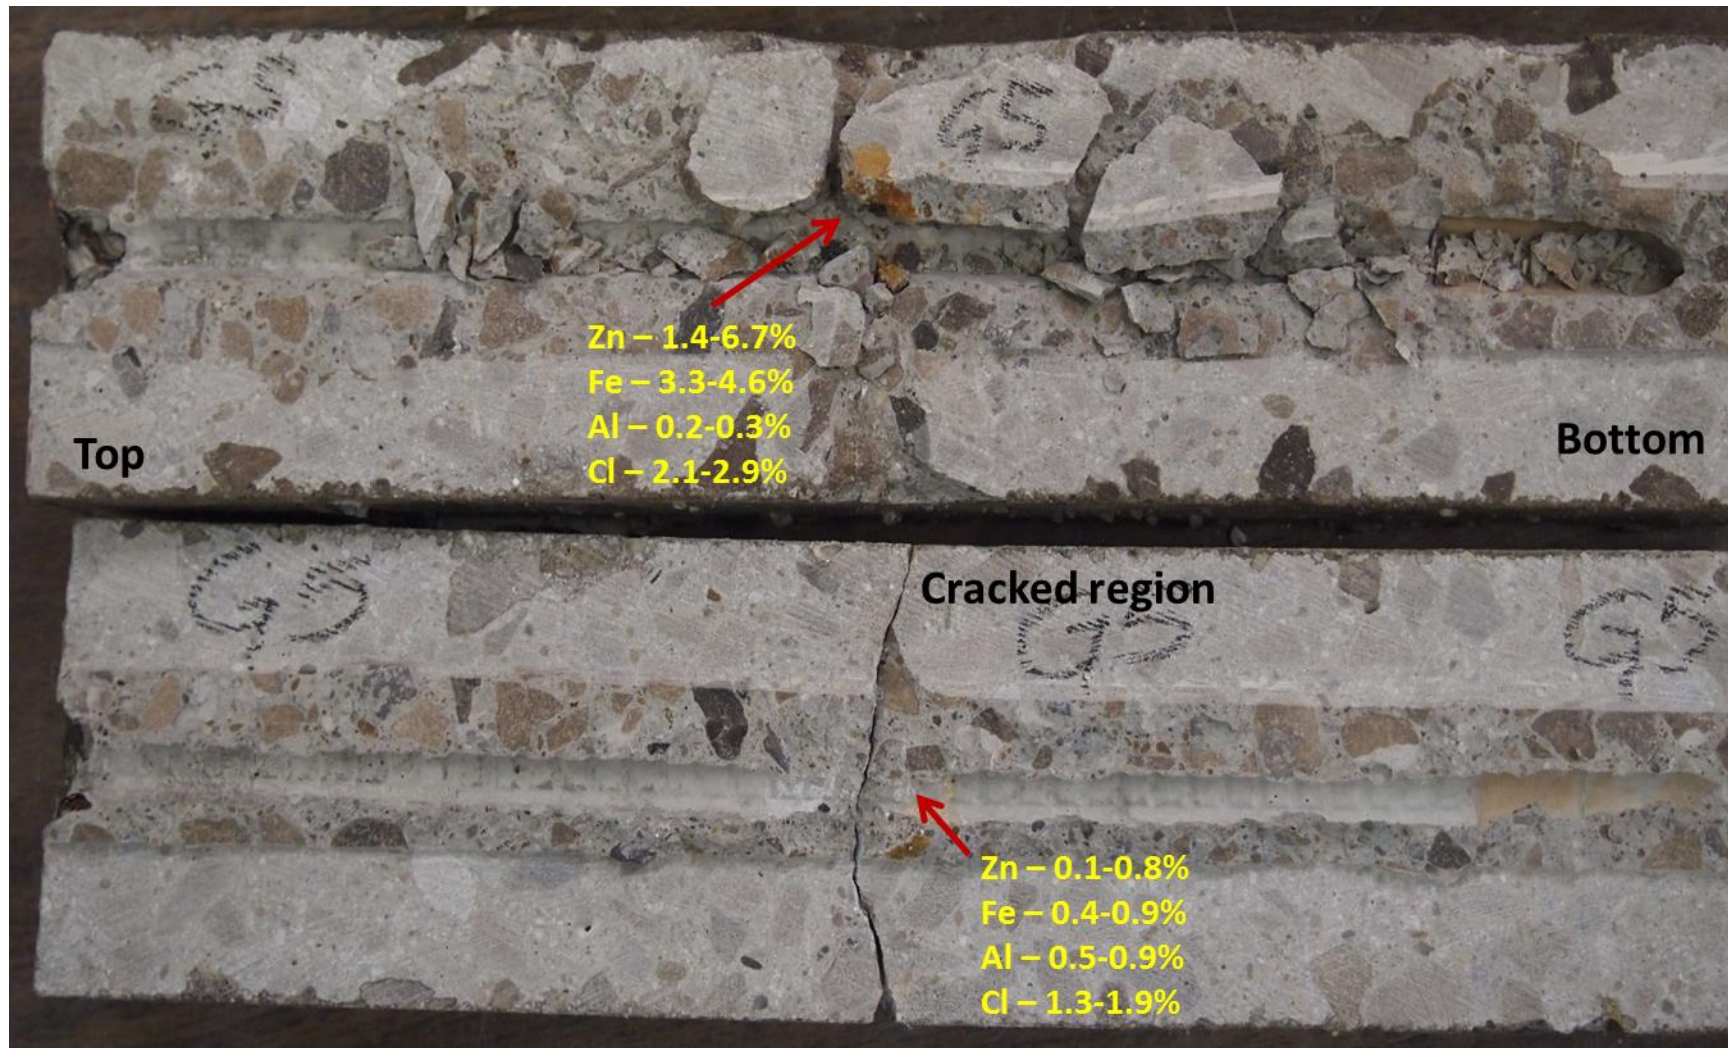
XRF analysis of autopsied transversely cracked HDG concrete specimen.
